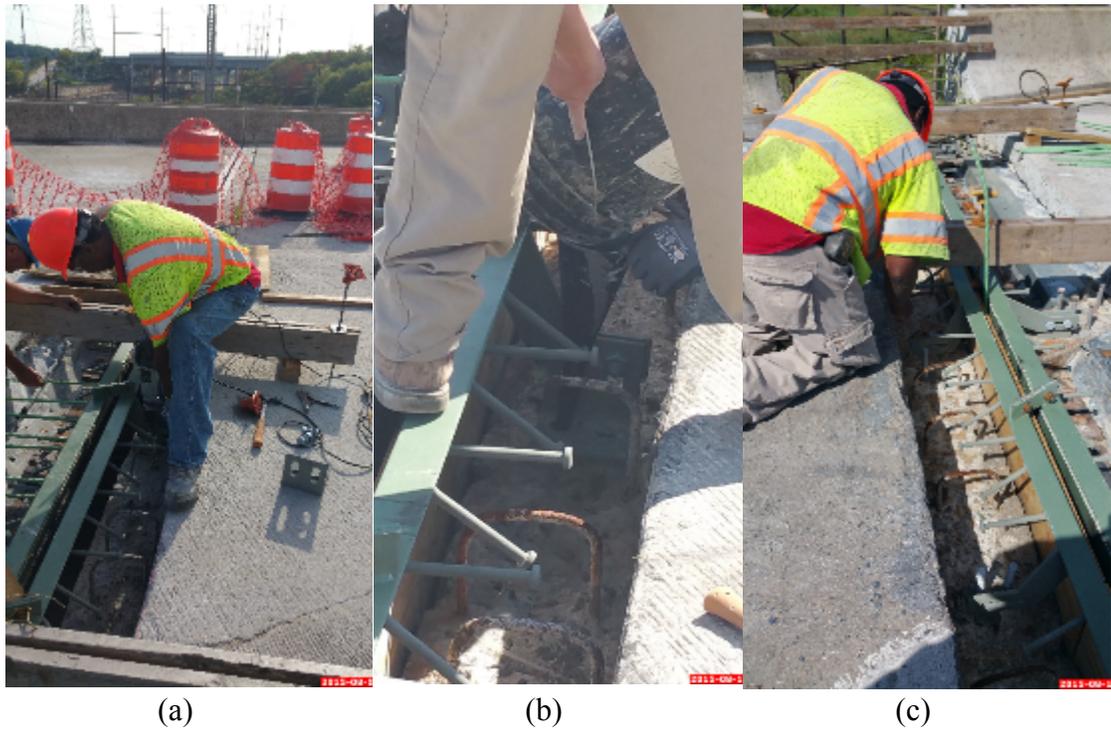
The Backwall Anchorage System including (a) Drilling of Anchorage Holes in the Backwall, (b) Pouring of Grout into Holes, and (c) Placement of the Anchorage Component into the Holes with Grout
